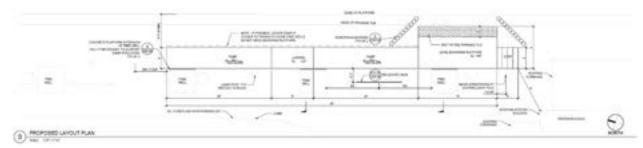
Corcoran Station – Mini-High Proposed Layout Plan
